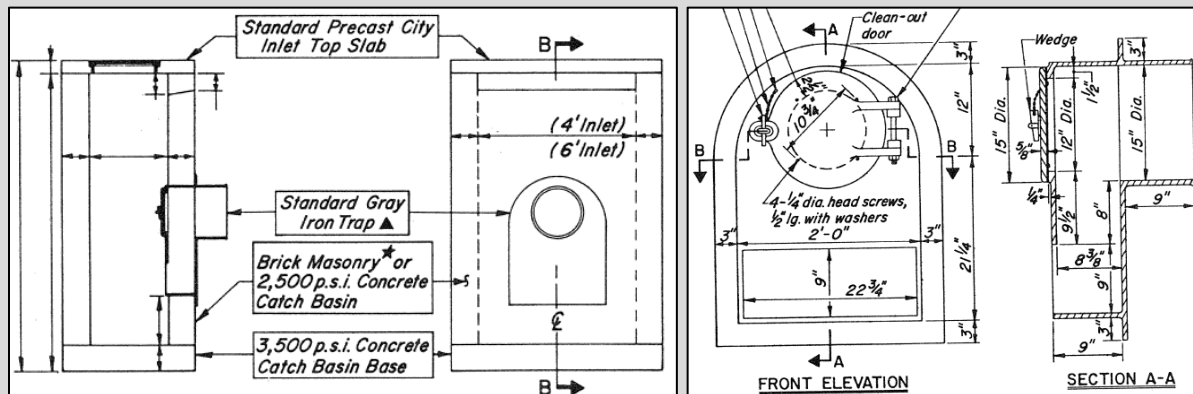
Inlet with Cast Trap and Cast Trap Standard Details
